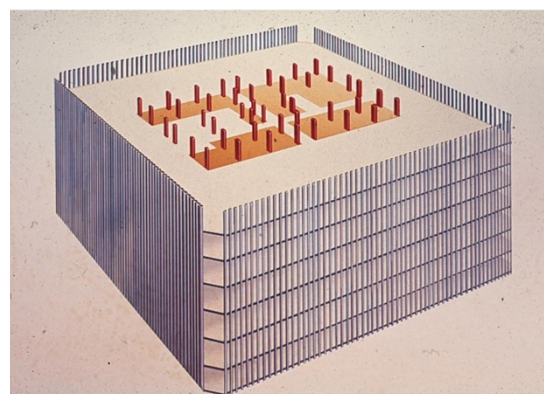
Historic engineering concept model of the original towers framed-tube structural system: a load-bearing perimeter tube of closely spaced columns, with interior columns confined to the service core and column-free floor space between.
